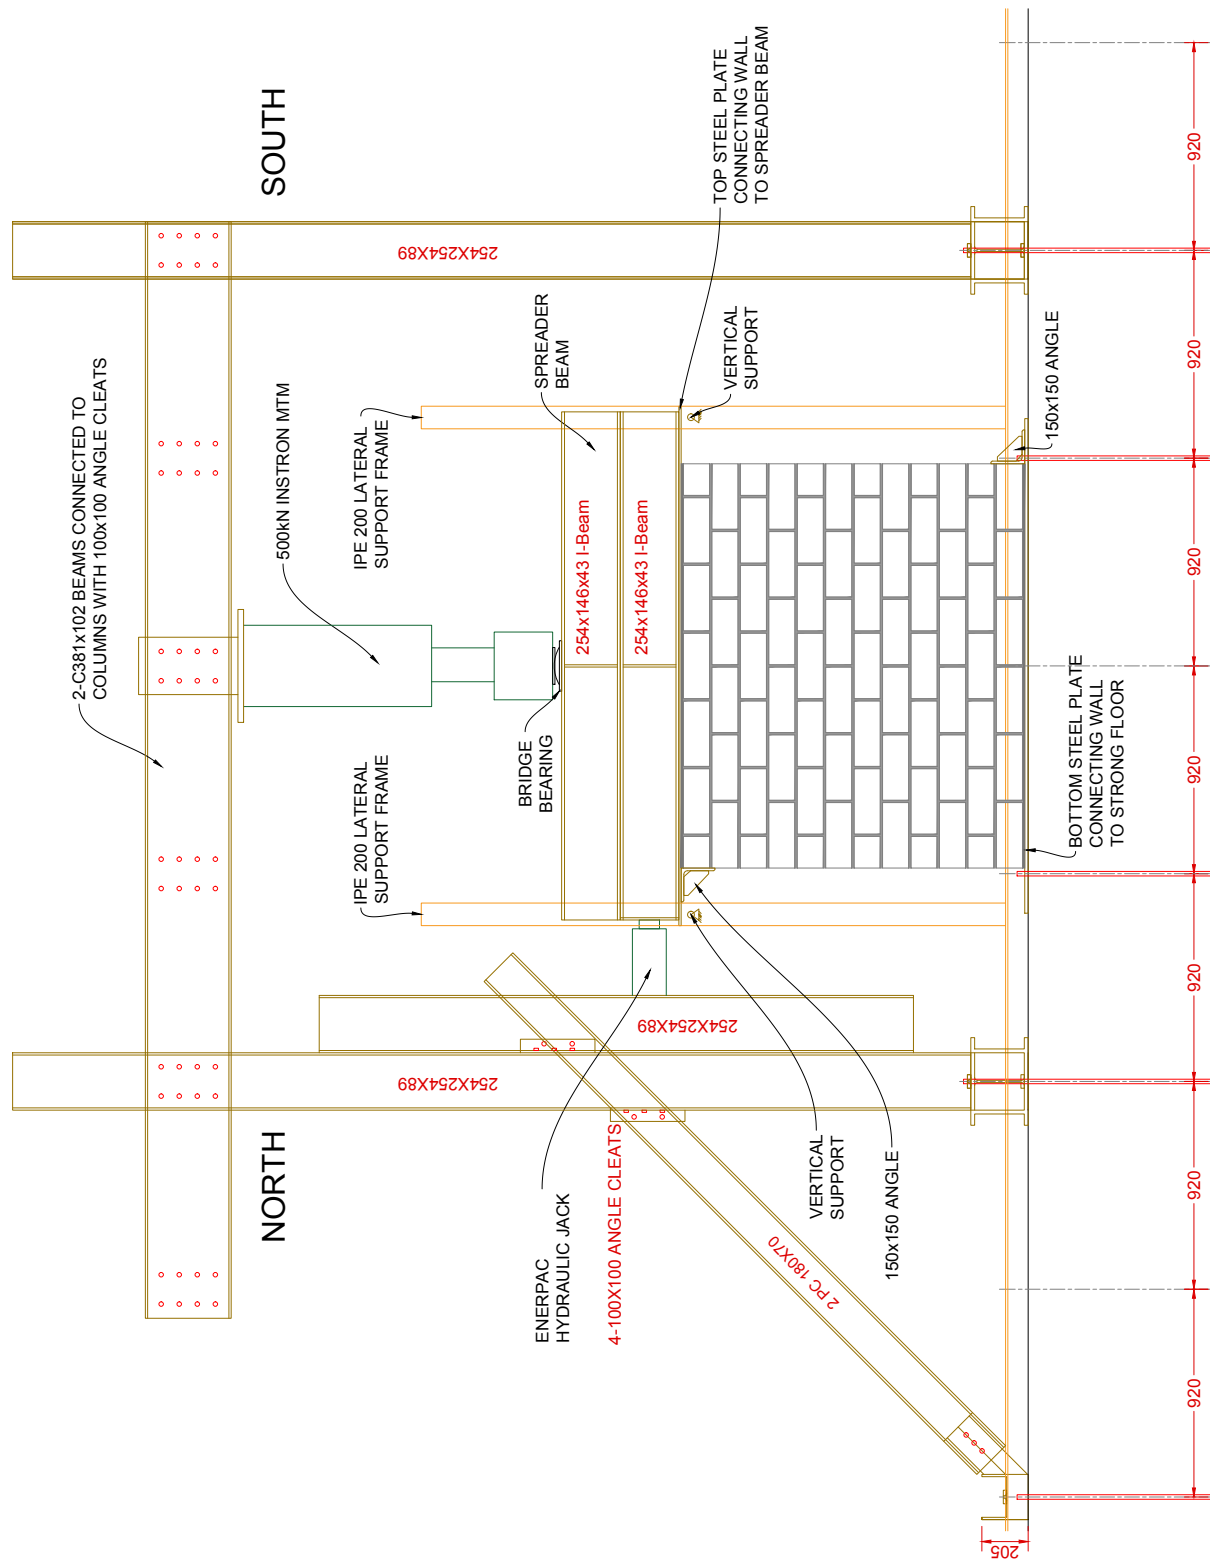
Drawing of Test Set-up A (all dimensions in mm)
